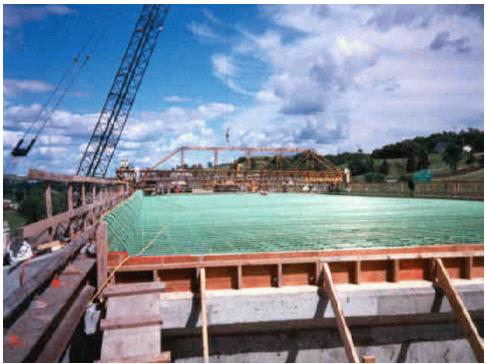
View of the control section bridge deck (epoxy coated rebar)
